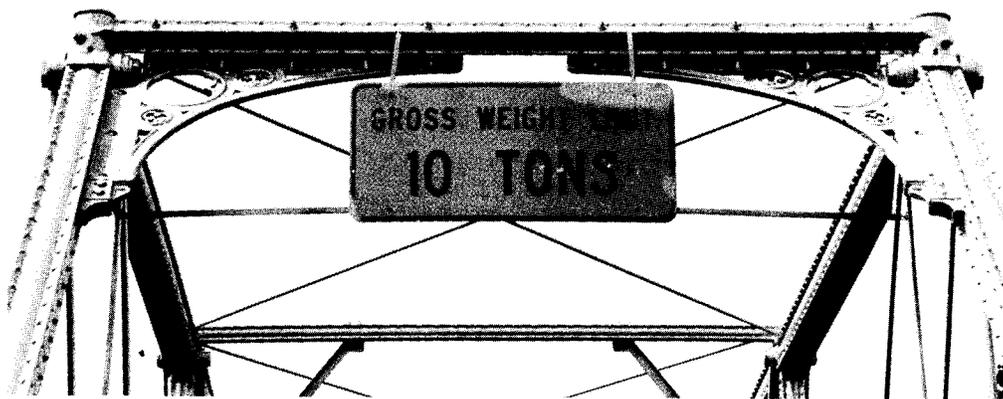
A detail of the portal bracing in Figure 2 showing the patented Phoenix columns and decorative strut bracing.
